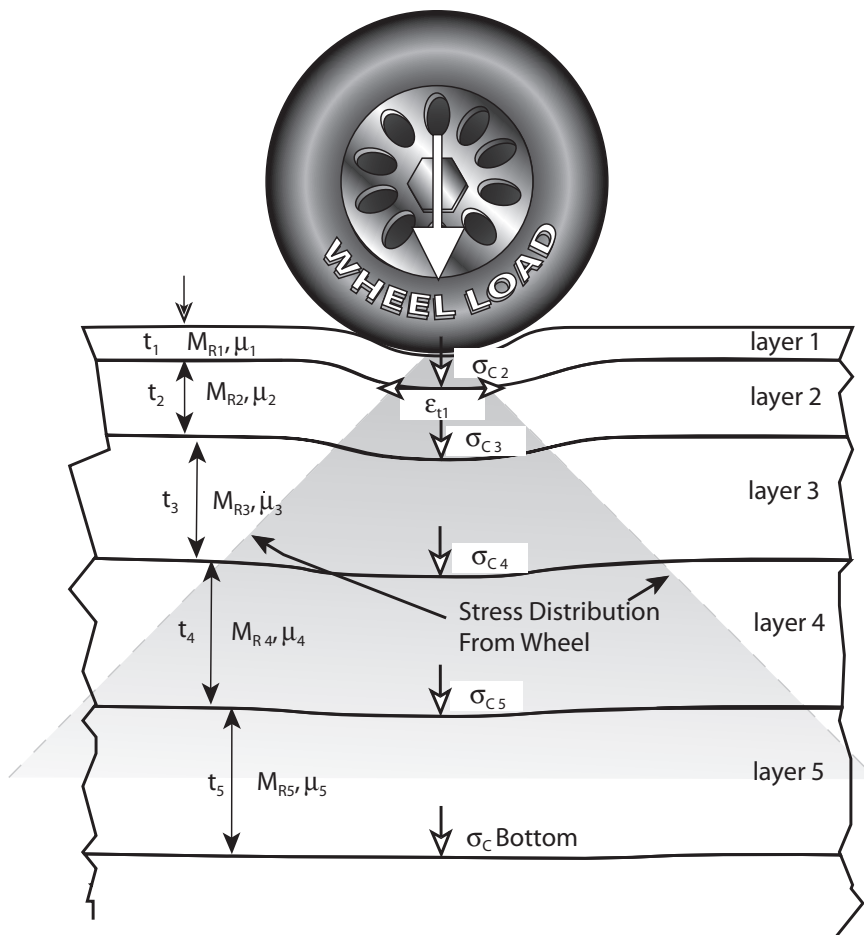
Elastic Pavement Layers Undergoing Simple Loading
